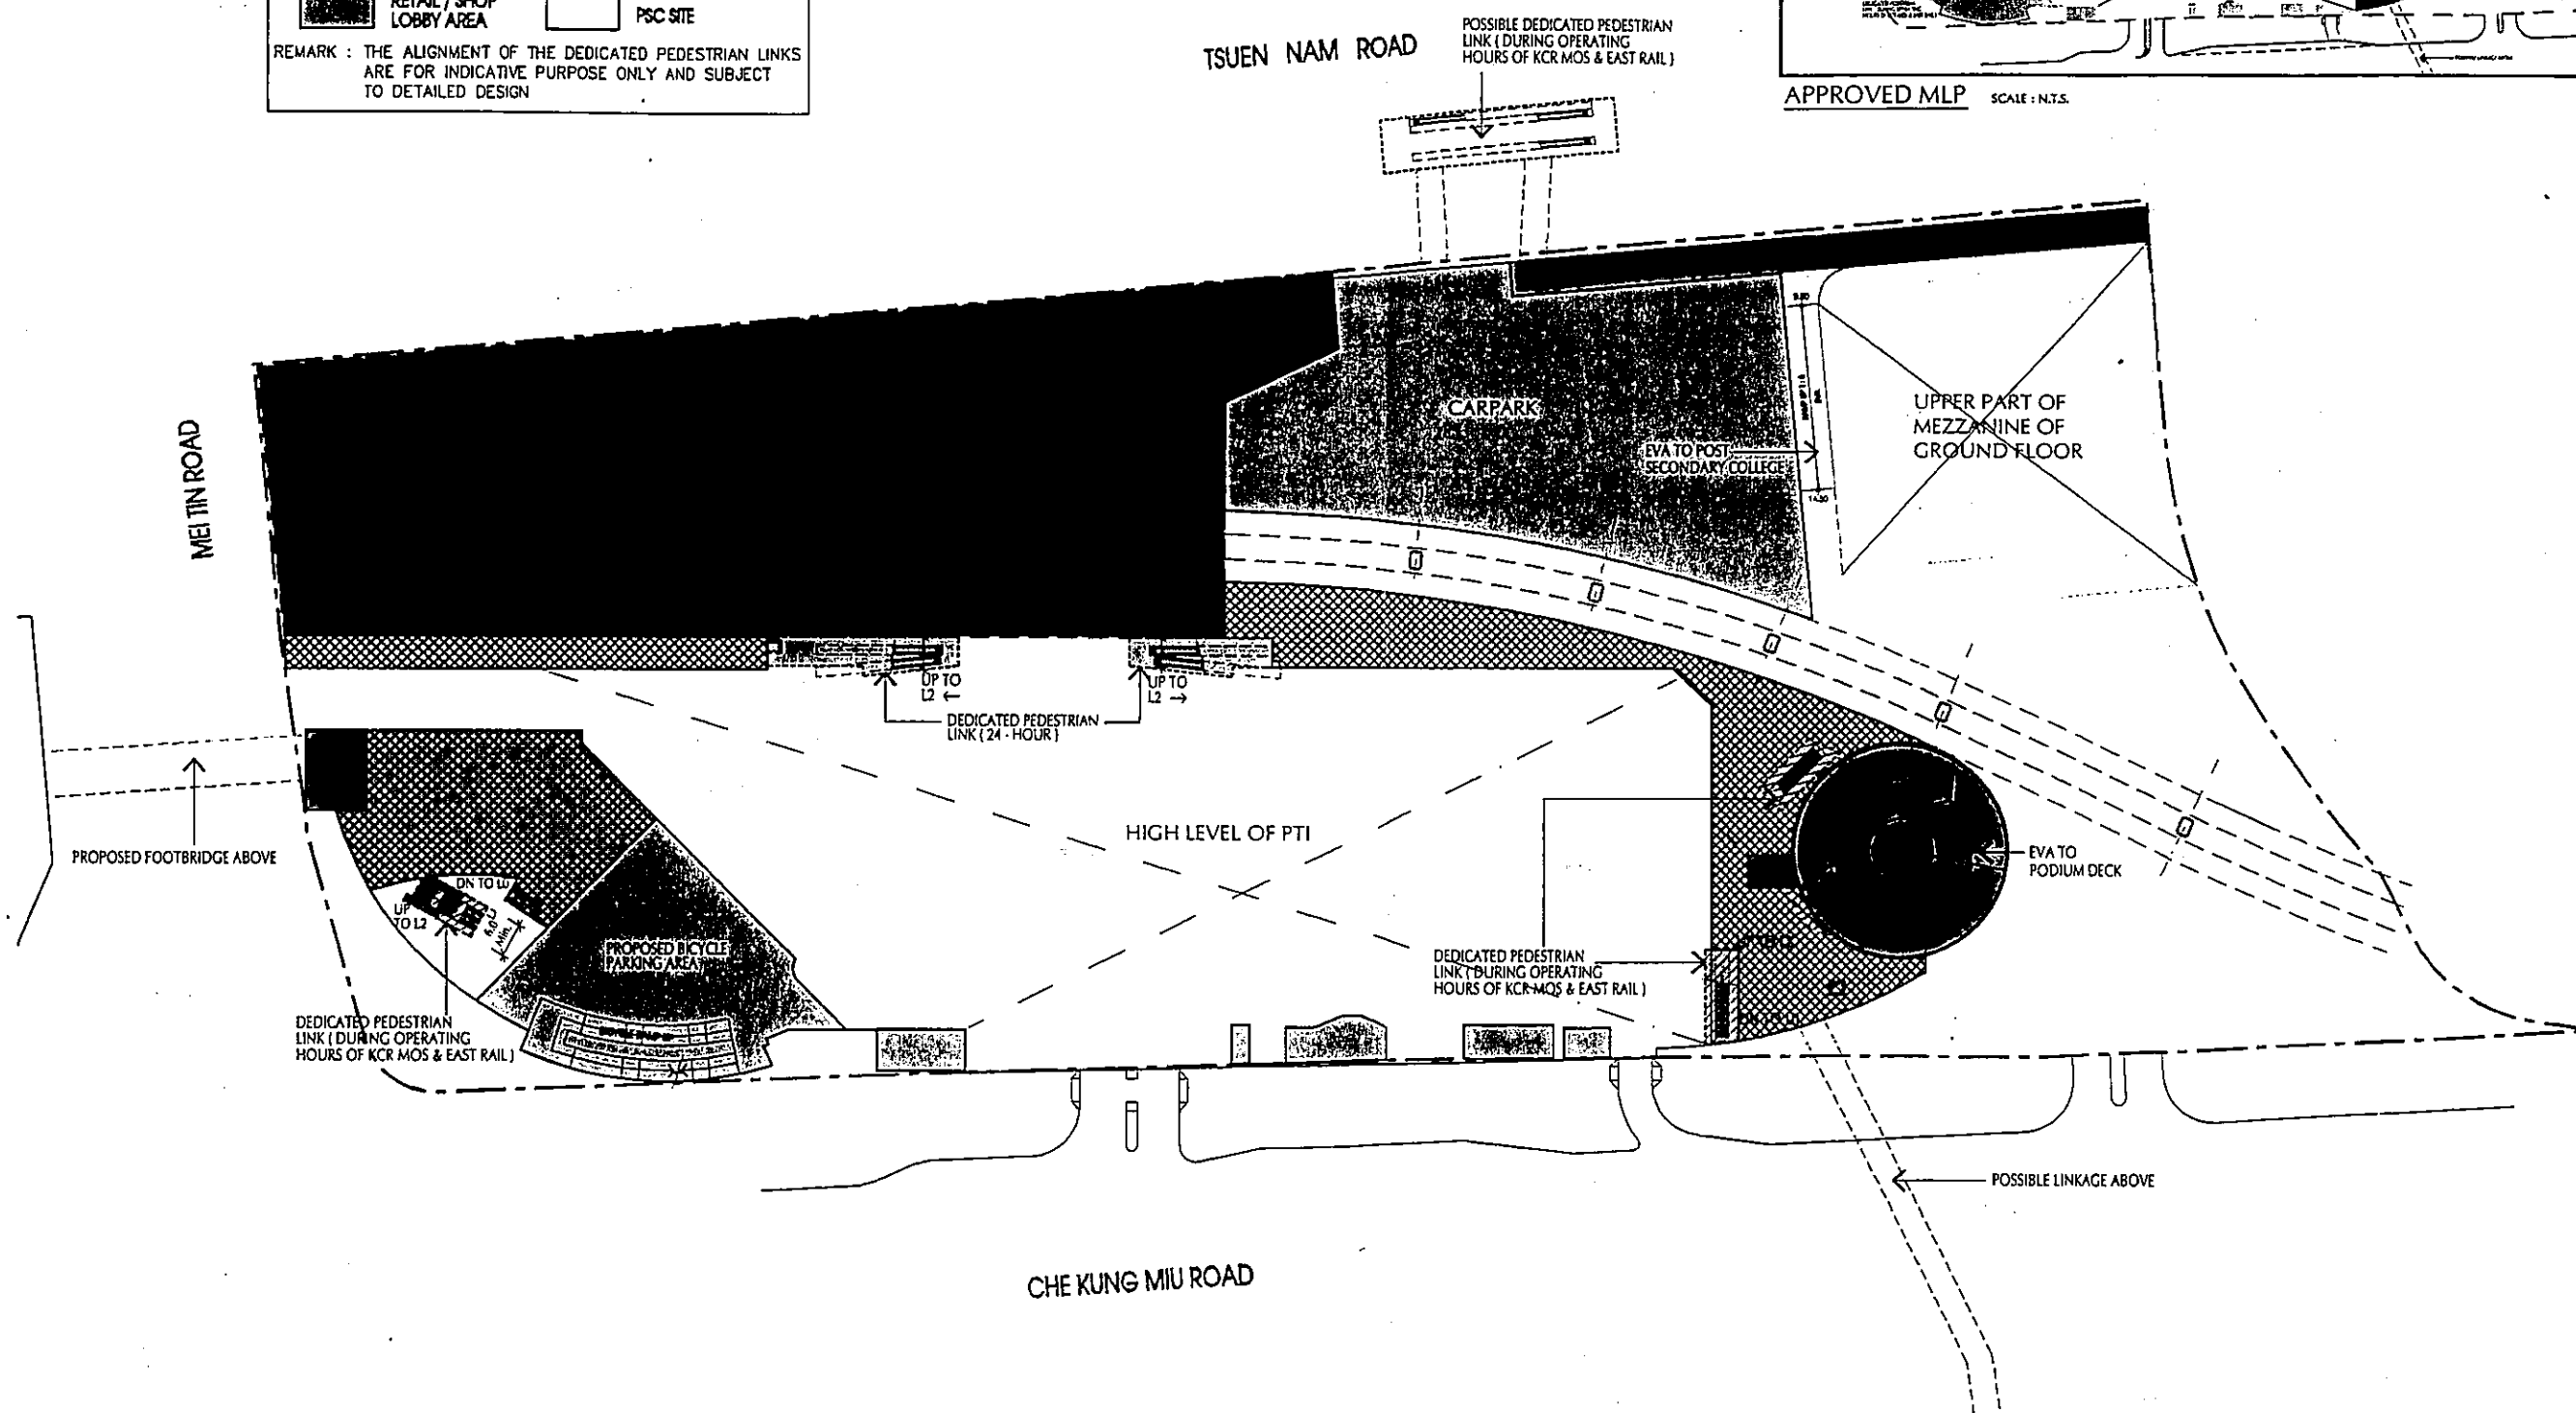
LEVEL 1 FLOOR PLAN
